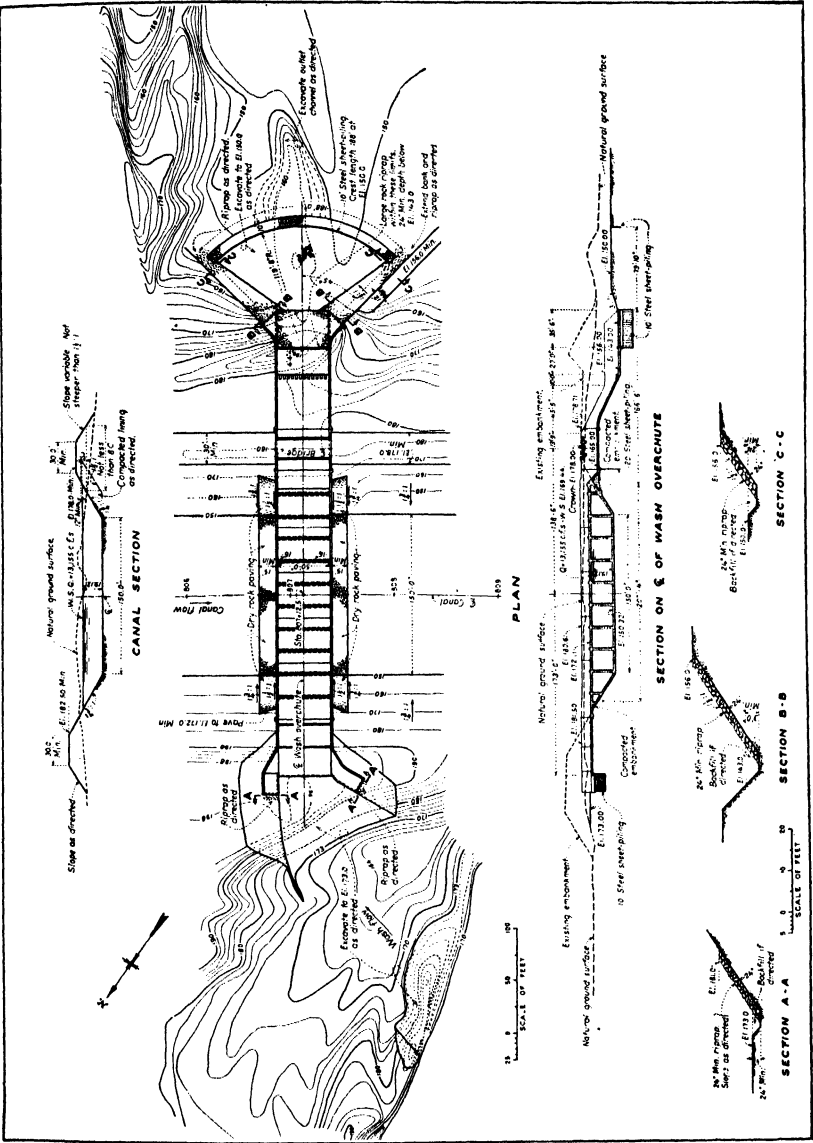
Overchute on All-American Canal near Yuma, Ariz.
